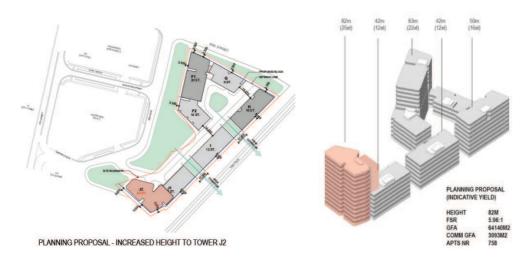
Extract from UDA by Plus Architecture showing footprint of Building J2 and site area for the land the subject of this Planning Proposal application (as outlined in red).
